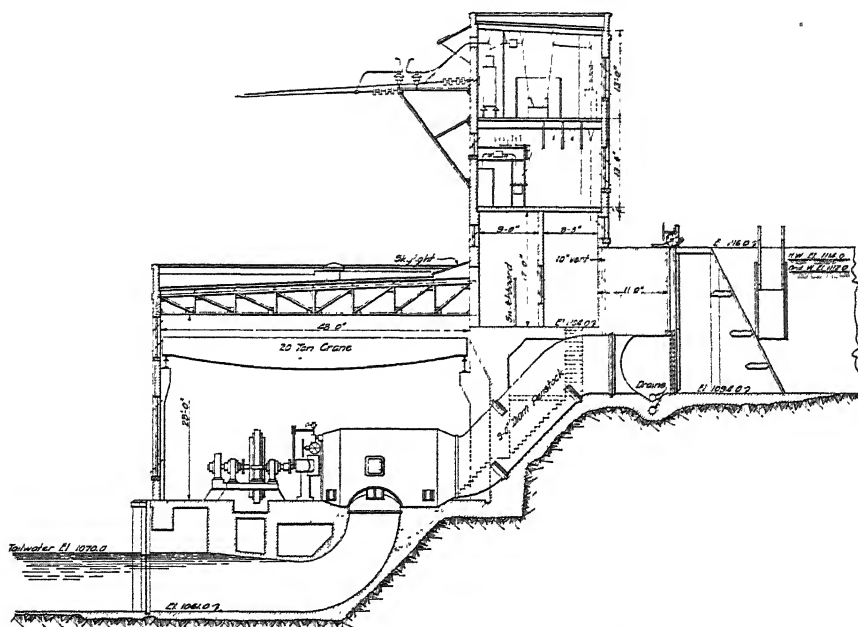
SECTIONAL ELEVATION, TWIN FALLS PLANT.
